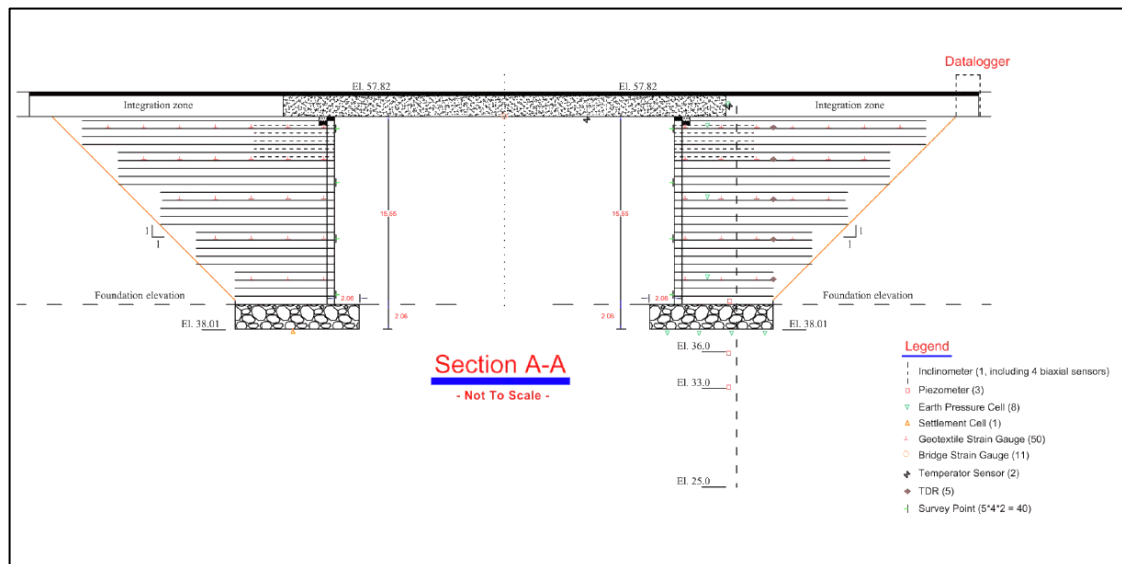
Instrumented plan for the 1-366 GRS-IBS bridge abutments in Delaware (Talebi et al.2014)
